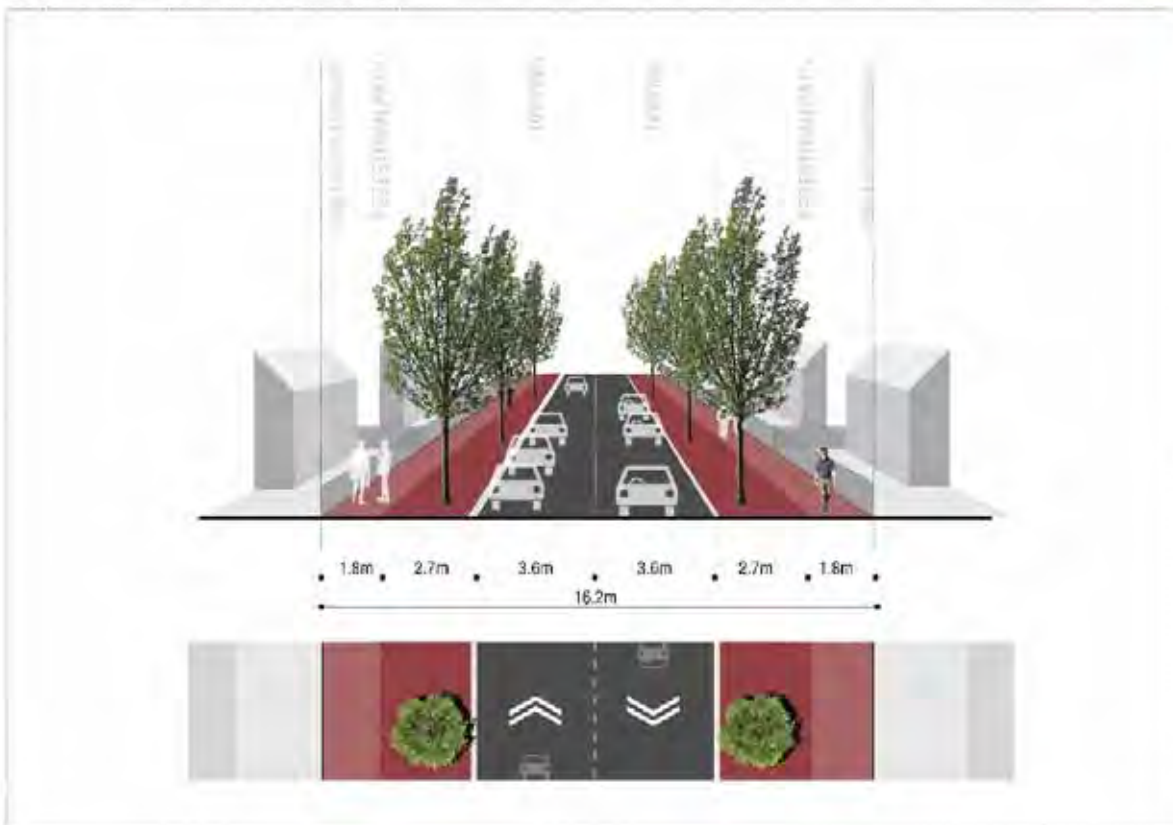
Modified Access Street C (Adjacent to Proposed POS)
